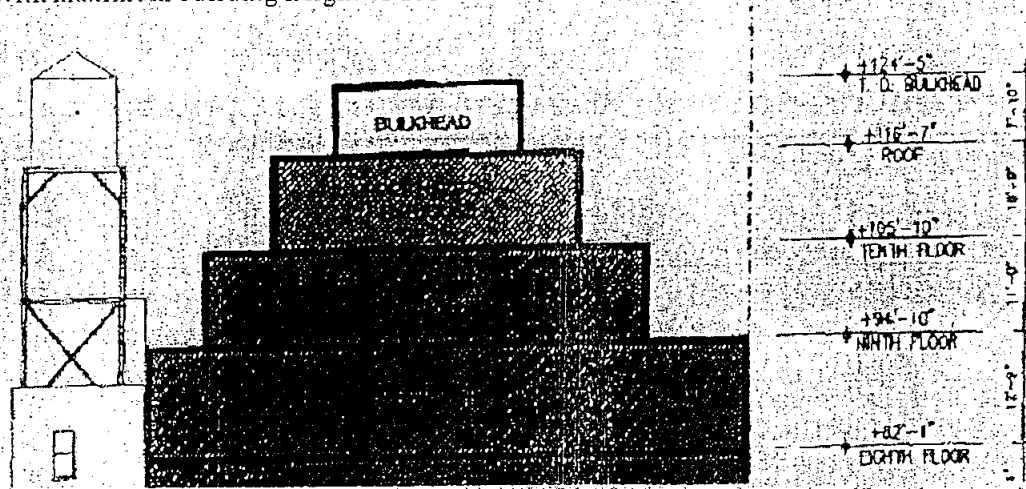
August 15, 2005 Section B-B stories plus 2 penthouse
